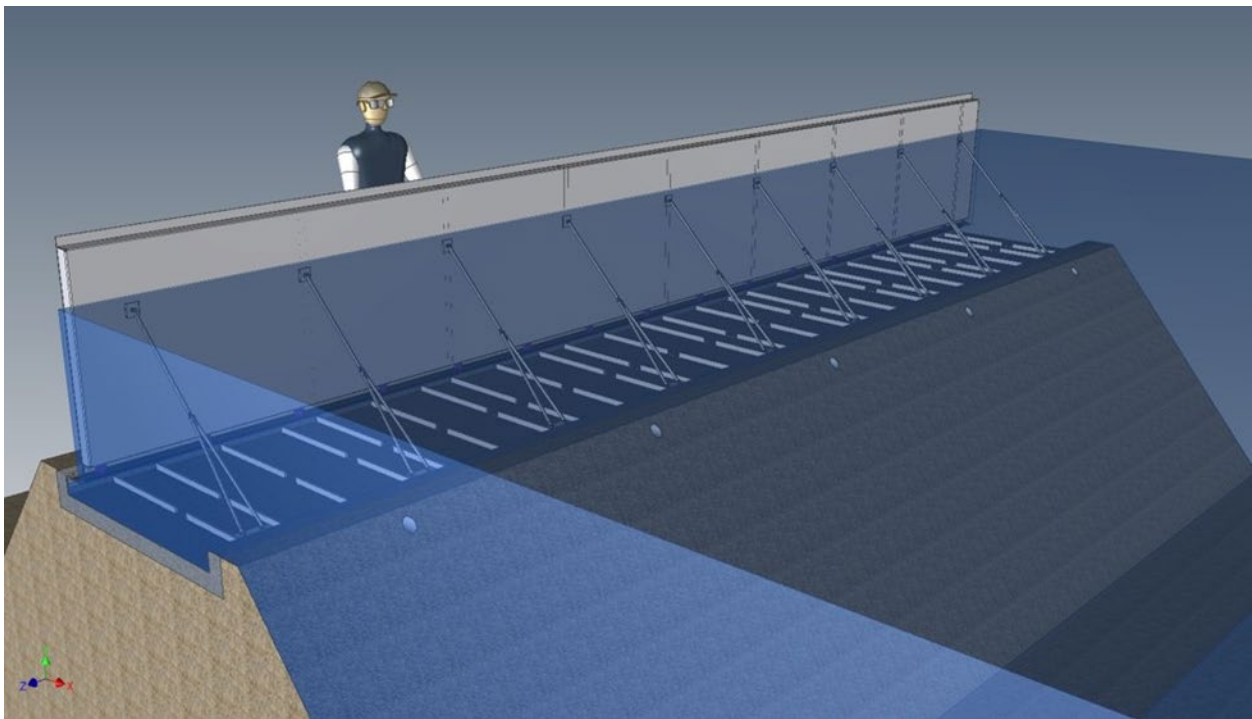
Typical Hinged Passive Barrier Cross Section
